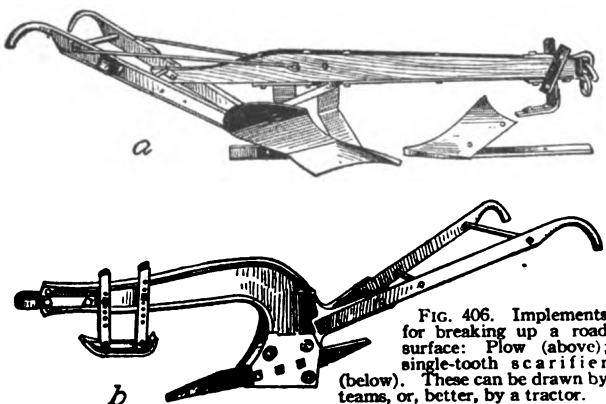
Implements for breaking up a road surface: Plow (above); single-tooth scarifier (below). These can be drawn by teams, or, better, by a tractor.
